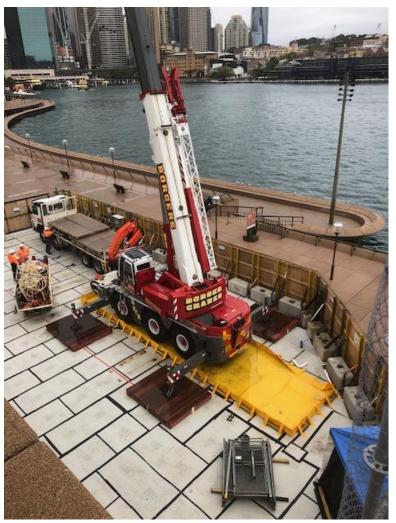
Crane parked within a bund to contain leaks (bund wall was mended during the audit)
